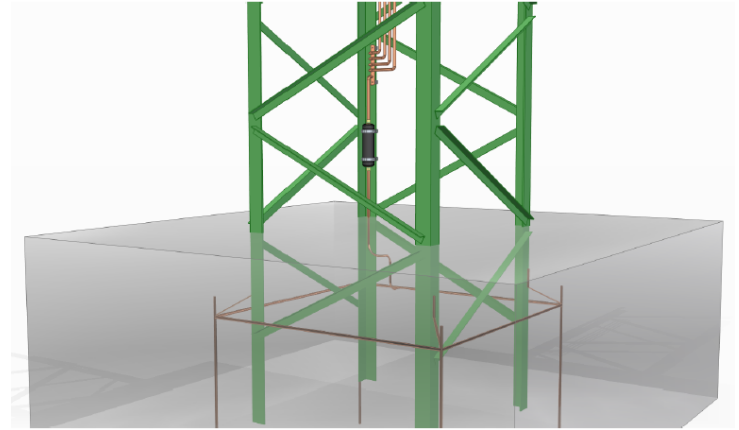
Dinfil filter type installation to protect the DDCE and all the electrical and electronic equipment of the tower (by means of an equipotential bar).
